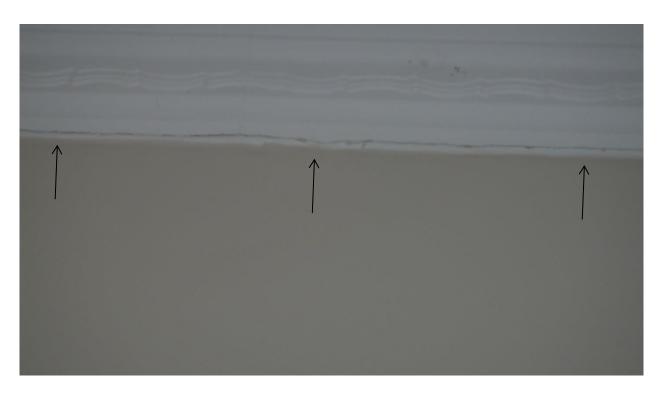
shows a crack to the mitre joint of the cornice in the south western corner of the Kitchen.
